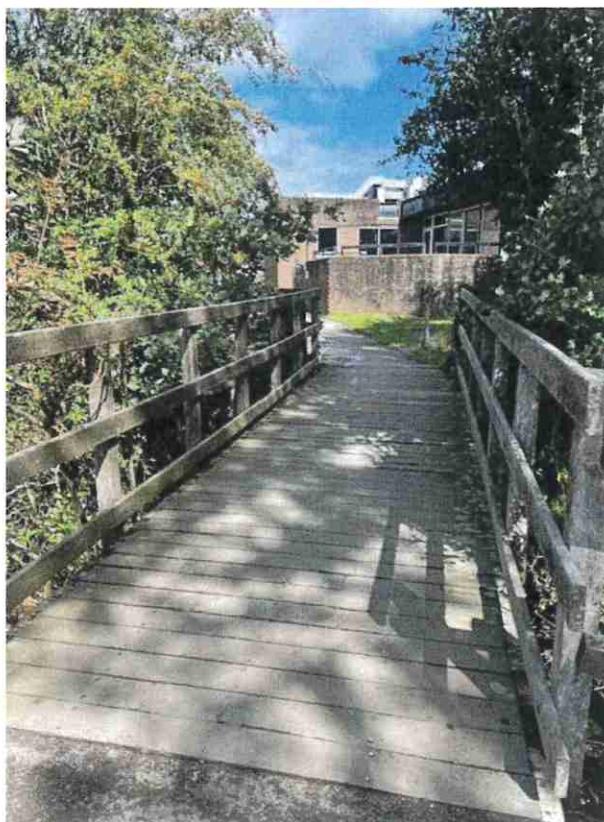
Existing bridge looking north towards Cranleigh Leisure Centre.
